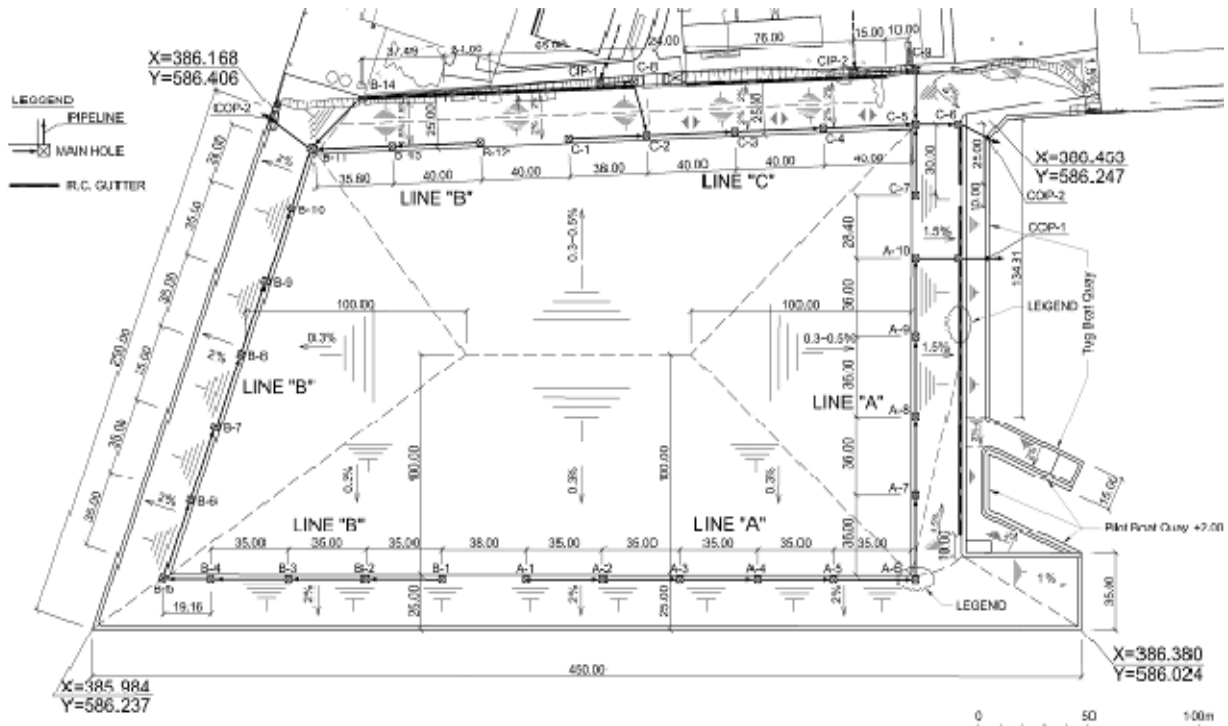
General Layout for Storm Water Drainage
